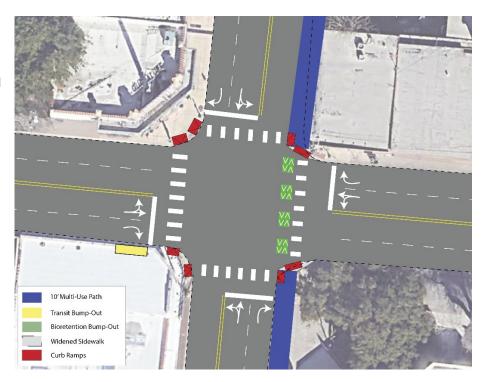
Alternative 2 – Conceptual Intersection Layout at Brazos Street & Guadalupe Street
